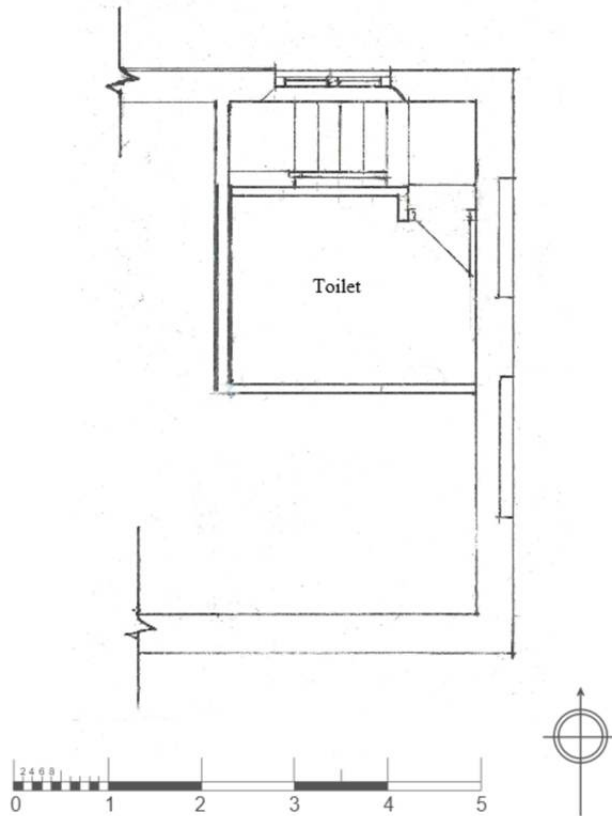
Floor Plan of the third floor or toilet area comprises of a small room with two unisex toilets and access to the loft hatch.
